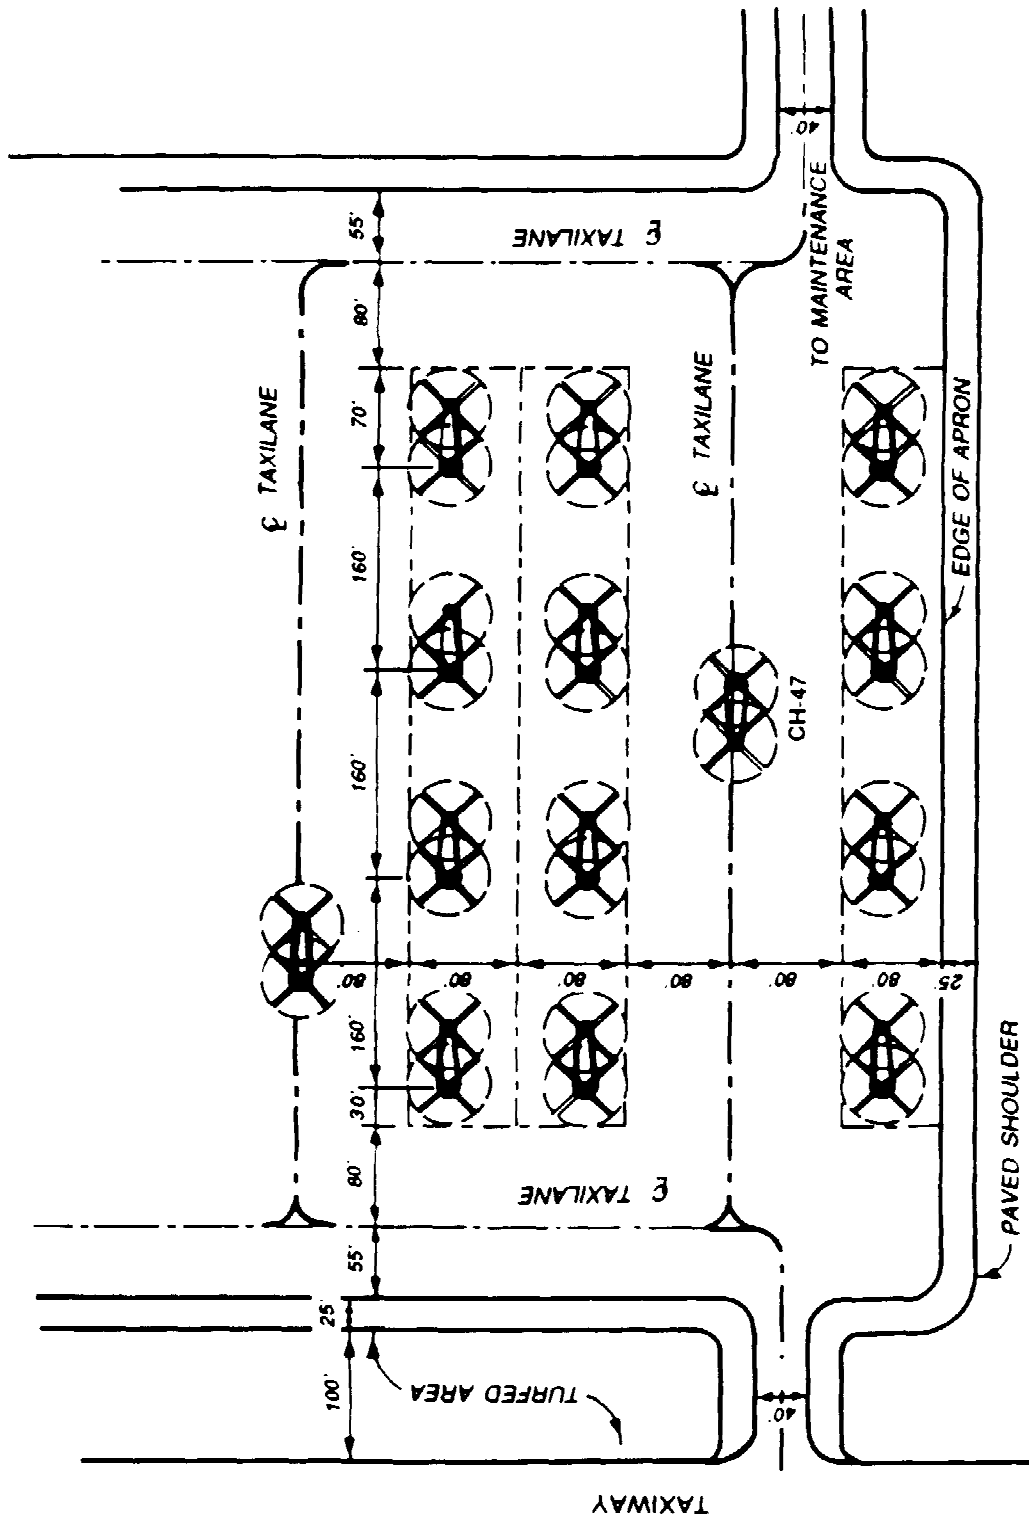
CH-47 Parking Plan, Type 2 (Double Parallel)
